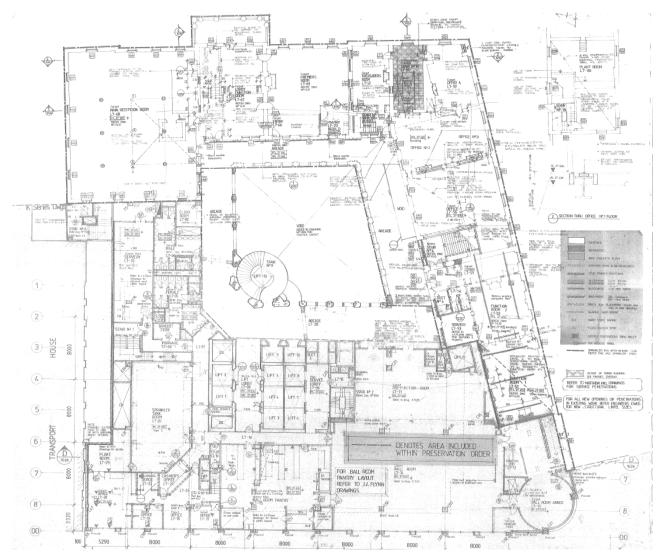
Extract proposed plans from 1983: First Floor (Treasury section)
